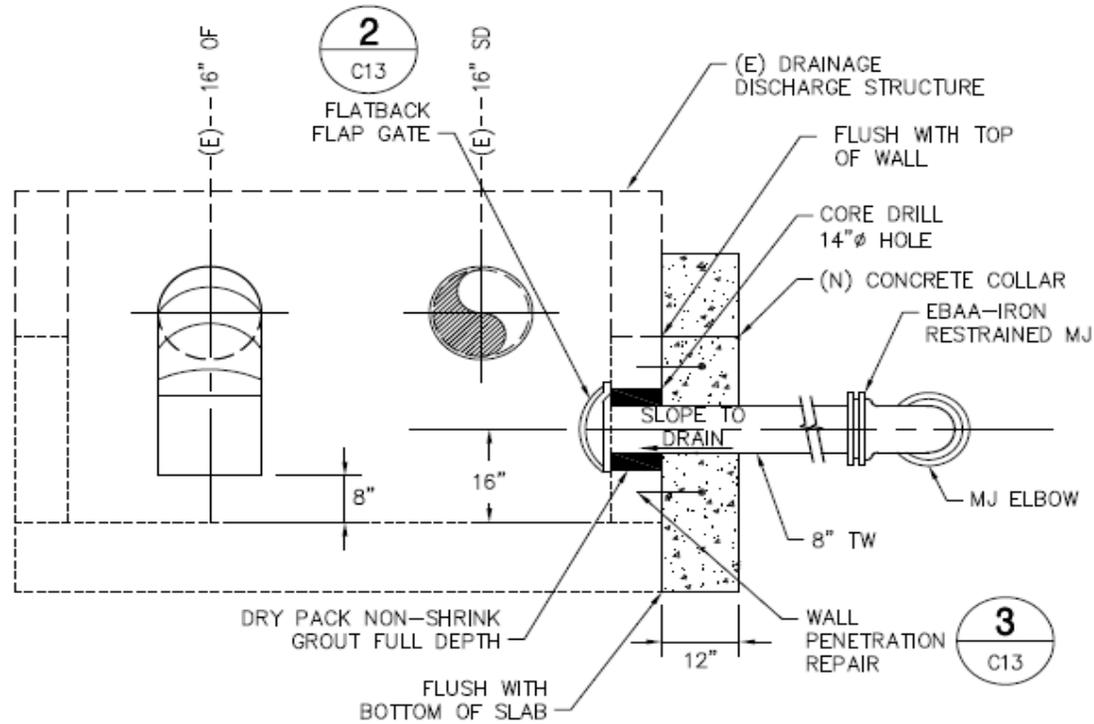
SECTION VIEW OF DISCHARGE OUTLET
